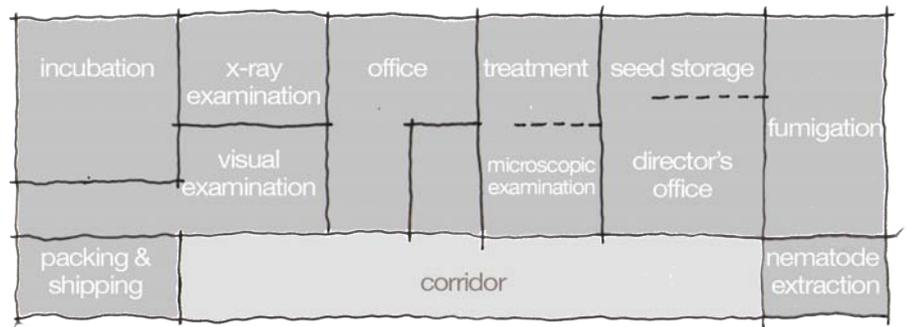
Layout plan of the main facility at Laguna (Kahn 1999:60)
